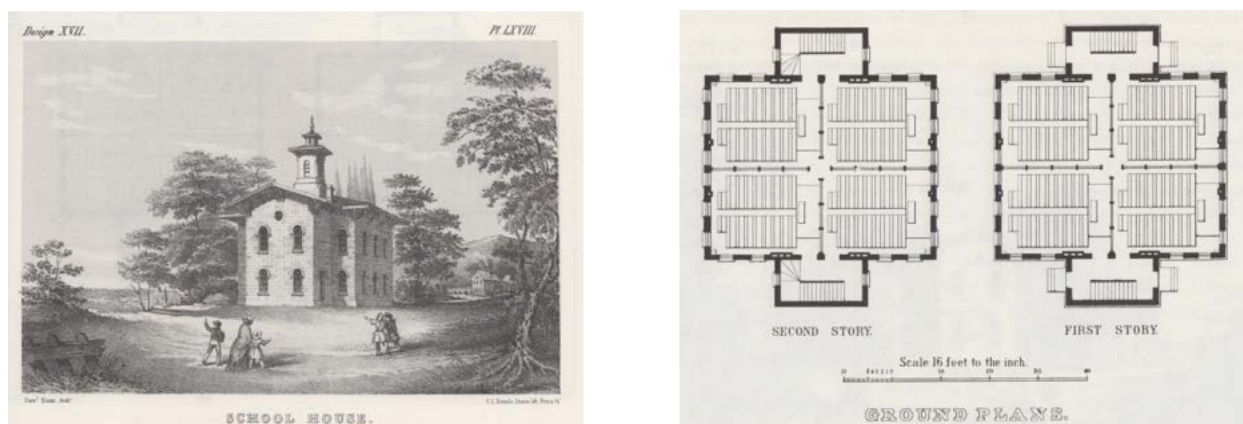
A rendering and floor plan of a “Philadelphia Plan” schoolhouse by Samuel Sloan, from “School-Houses,” *The Model Architect*, vol. 1, 1852.
